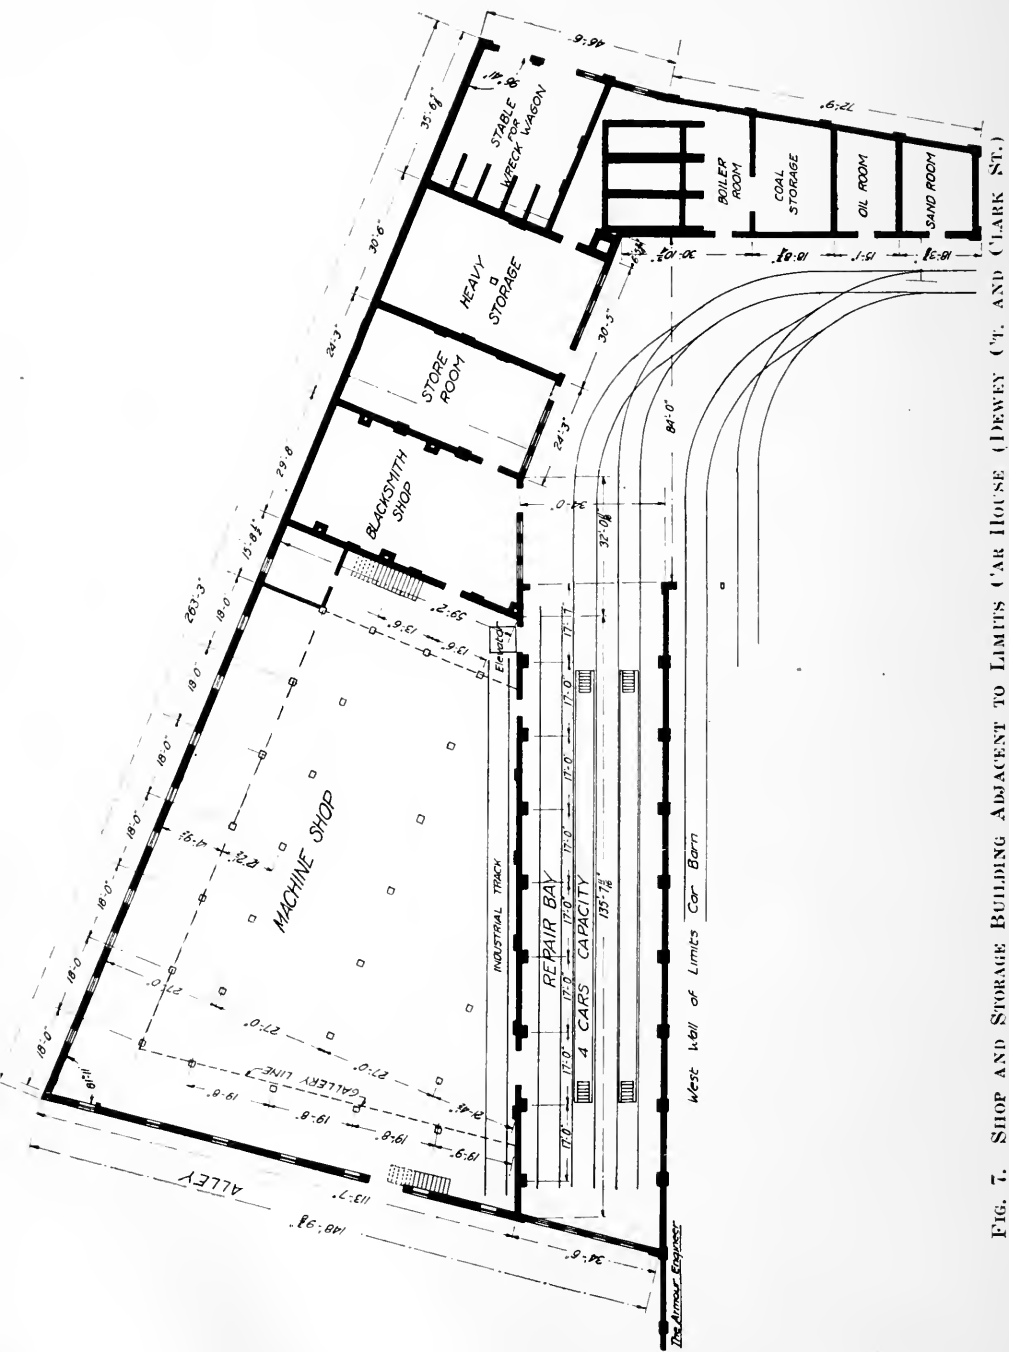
SHOP AND STORAGE BUILDING ADJACENT TO LIMUS CAR HOUSE (DEWEY (VT. AND CLARK ST.)
